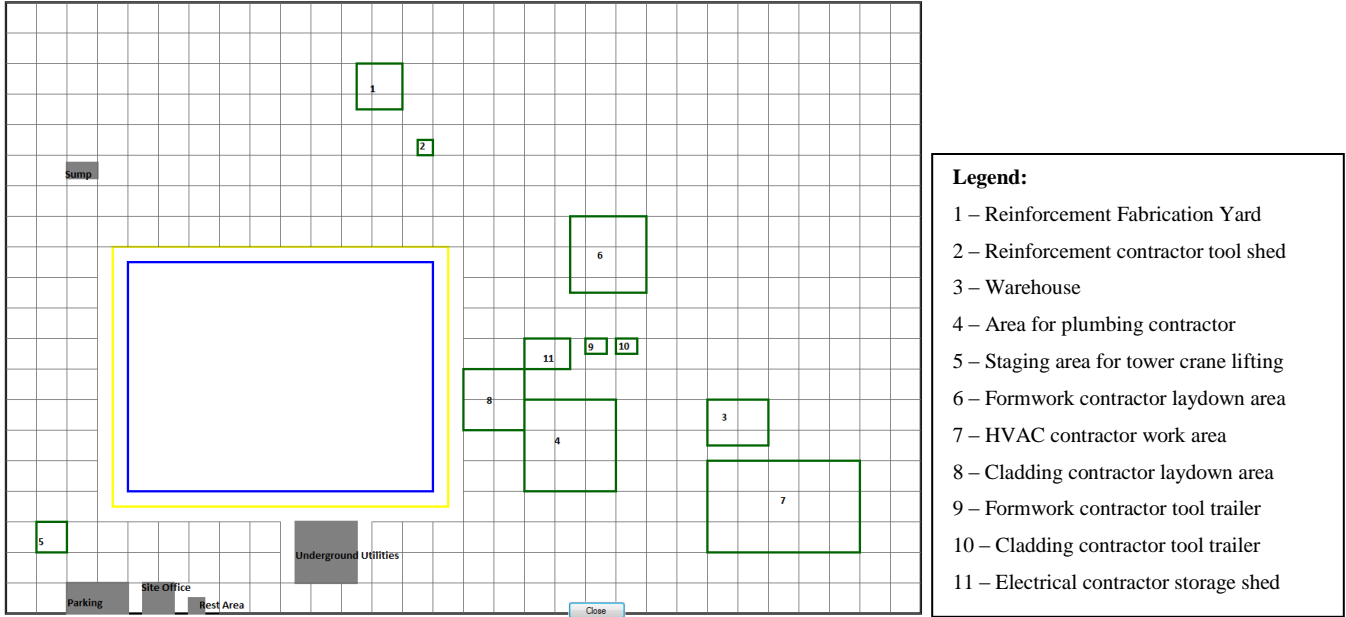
CONSITEPLAN – Site Utilization Plan 3
